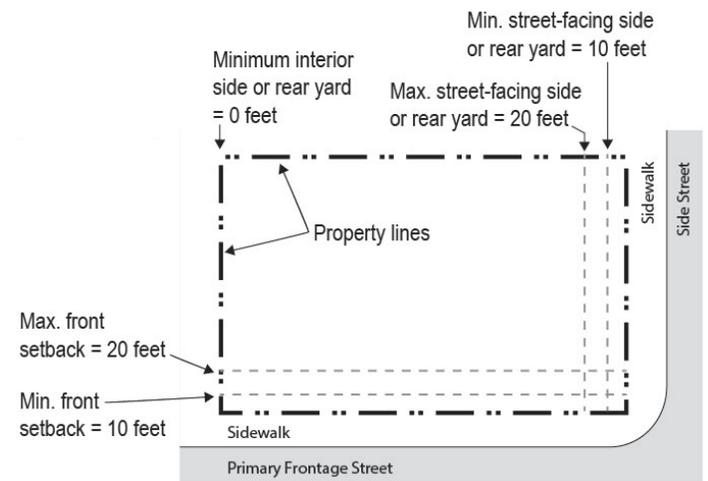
RC-DT Setbacks - with ground-floor residential
